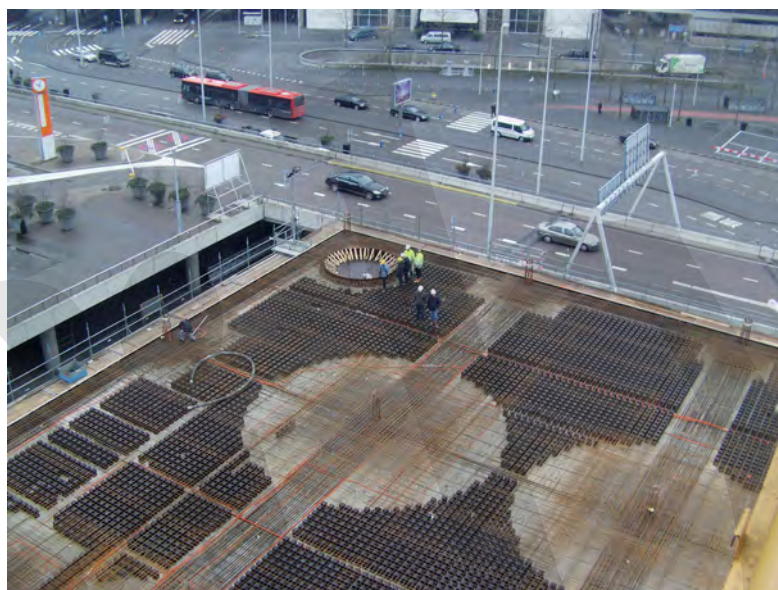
Installed Airdeck precast biscuit slabs with localised void formers in combination with post tensioning covering full floor area (see also Chapter 5). Act as composite flat slab when combined with insitu concrete topping, courtesy of Airdeck Building Concepts nv.
